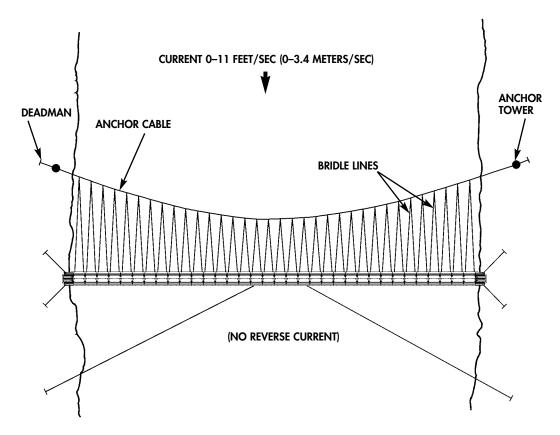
Typical Use of Overhead Cable as Upstream Anchorage.
